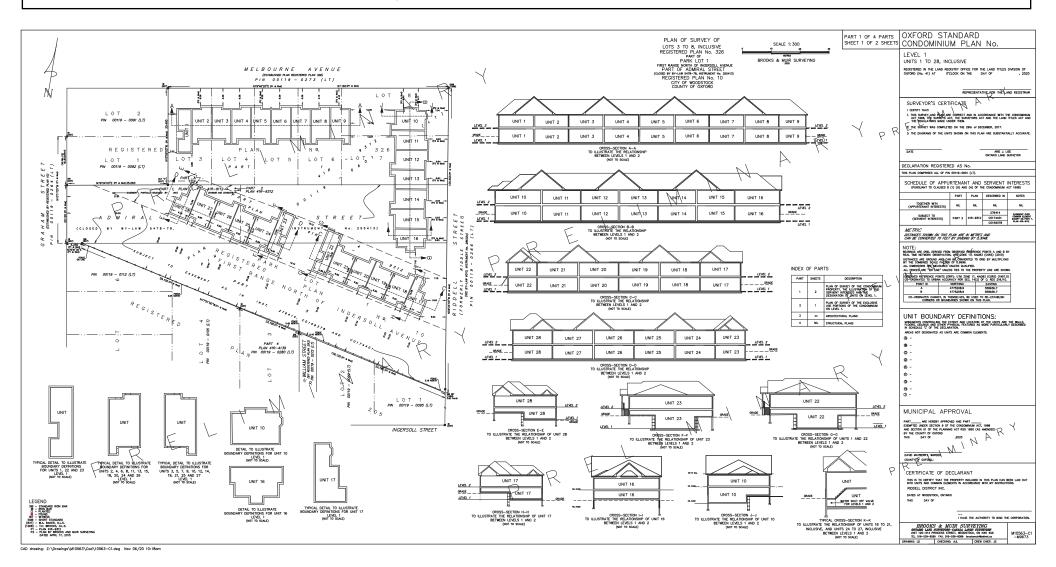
Proposed Draft Plan of Condominium (Level 2) CD 15-08-8 - Riddell District Inc. - 225 Riddell Street, Woodstock
